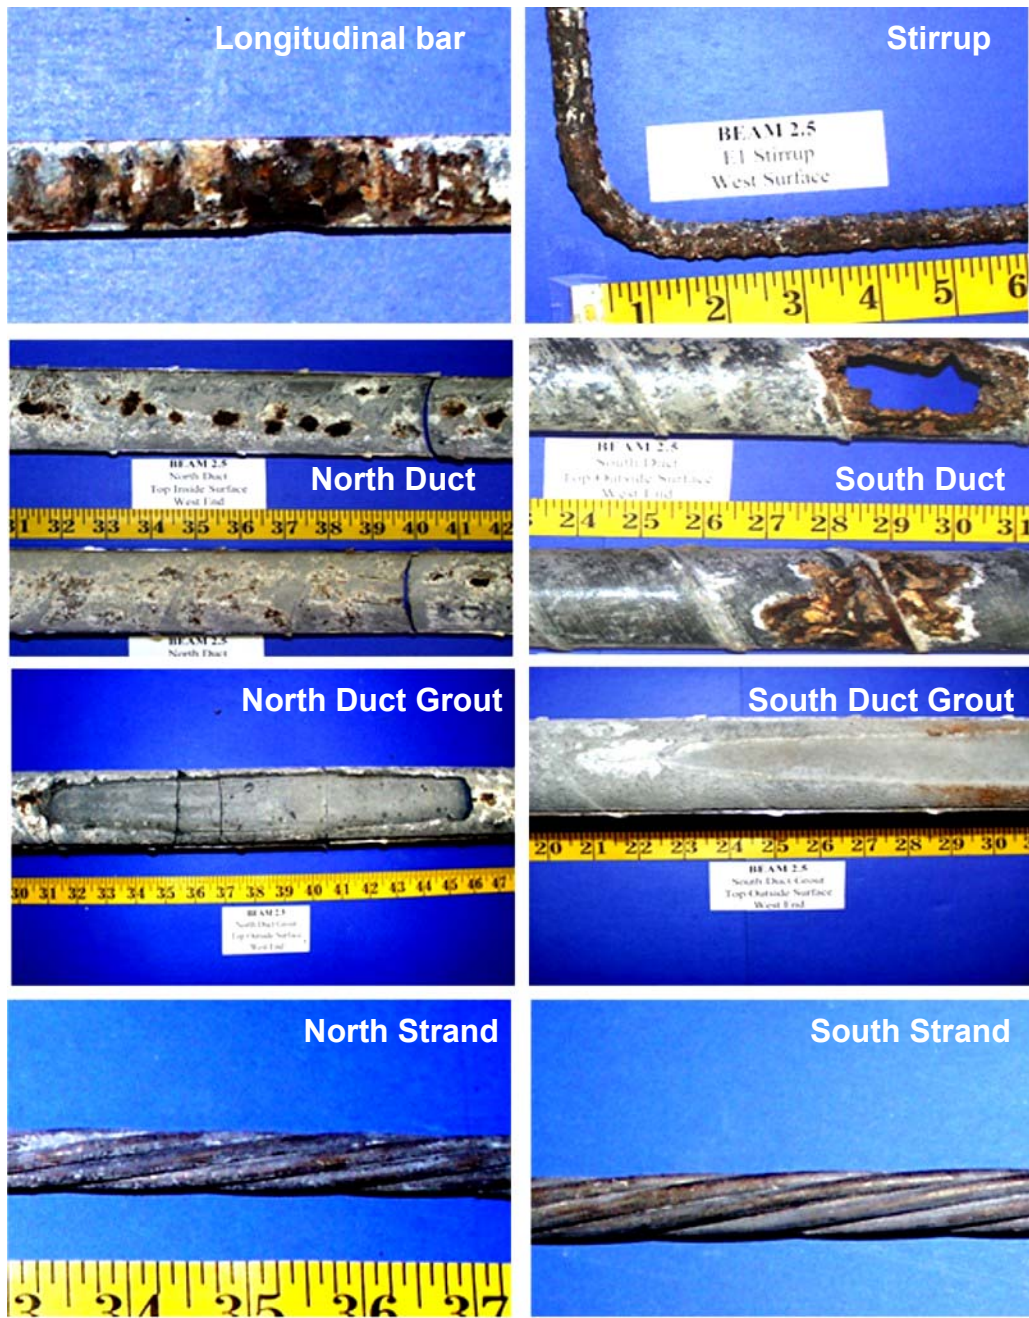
Specimen 2.5 – Reinforcing Elements
